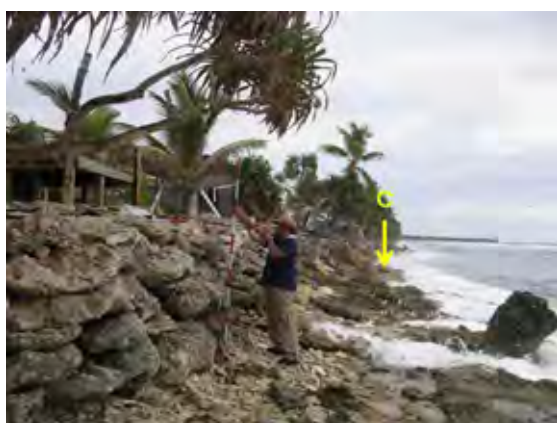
Private Seawall of Sacked-up Beachrock Fragments
